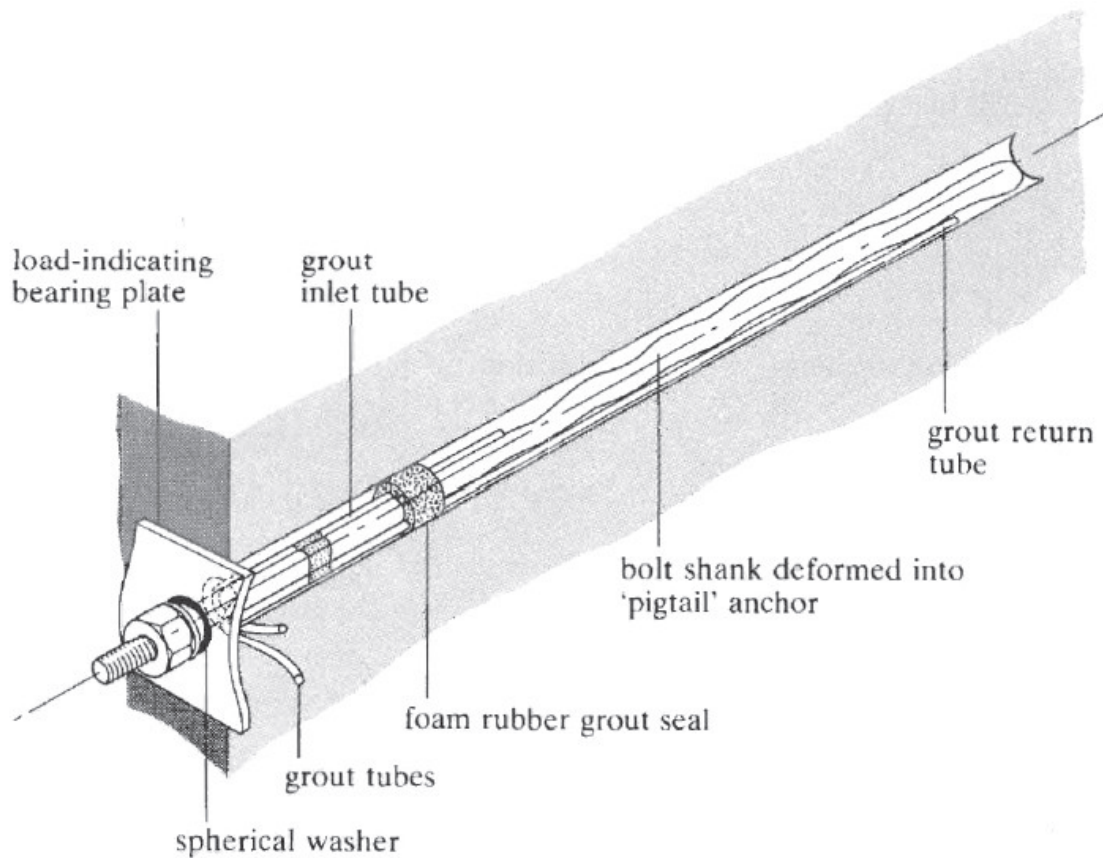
Rock bolt with a deformed section used to form a grouted anchorage (After Hoek & Brown 1980)
